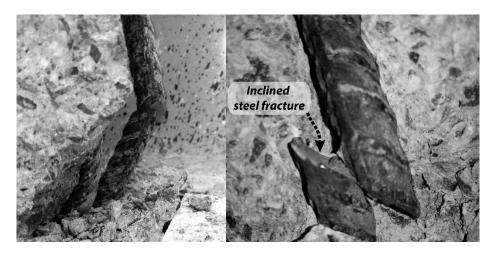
Reinforcement fracture at the shorter flange of specimen W7.
